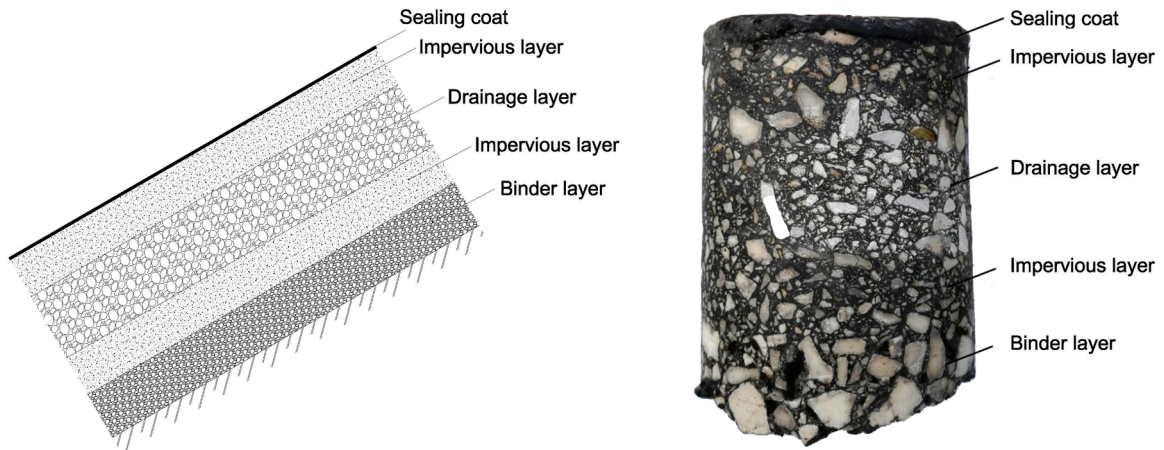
Typical cross-section and core of an asphalt concrete impervious membrane.
